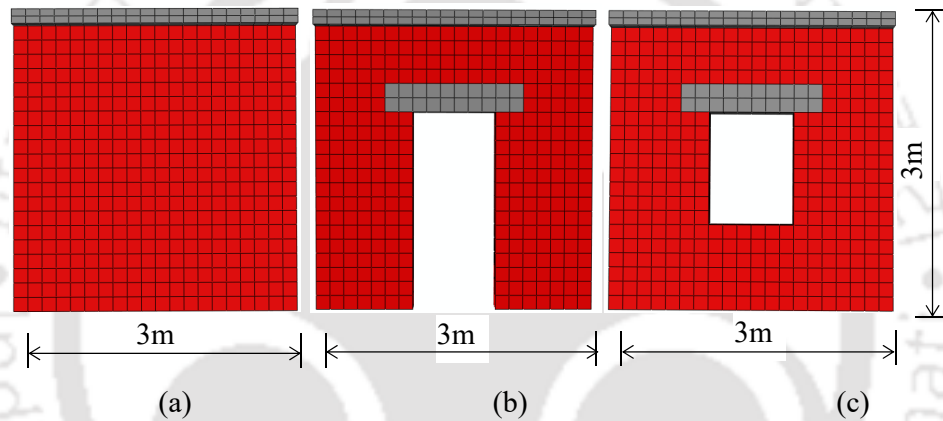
FE models of wall specimens tested in the present study: (a) Wall 1, (b) Wall 2, and (c) Wall 3.
